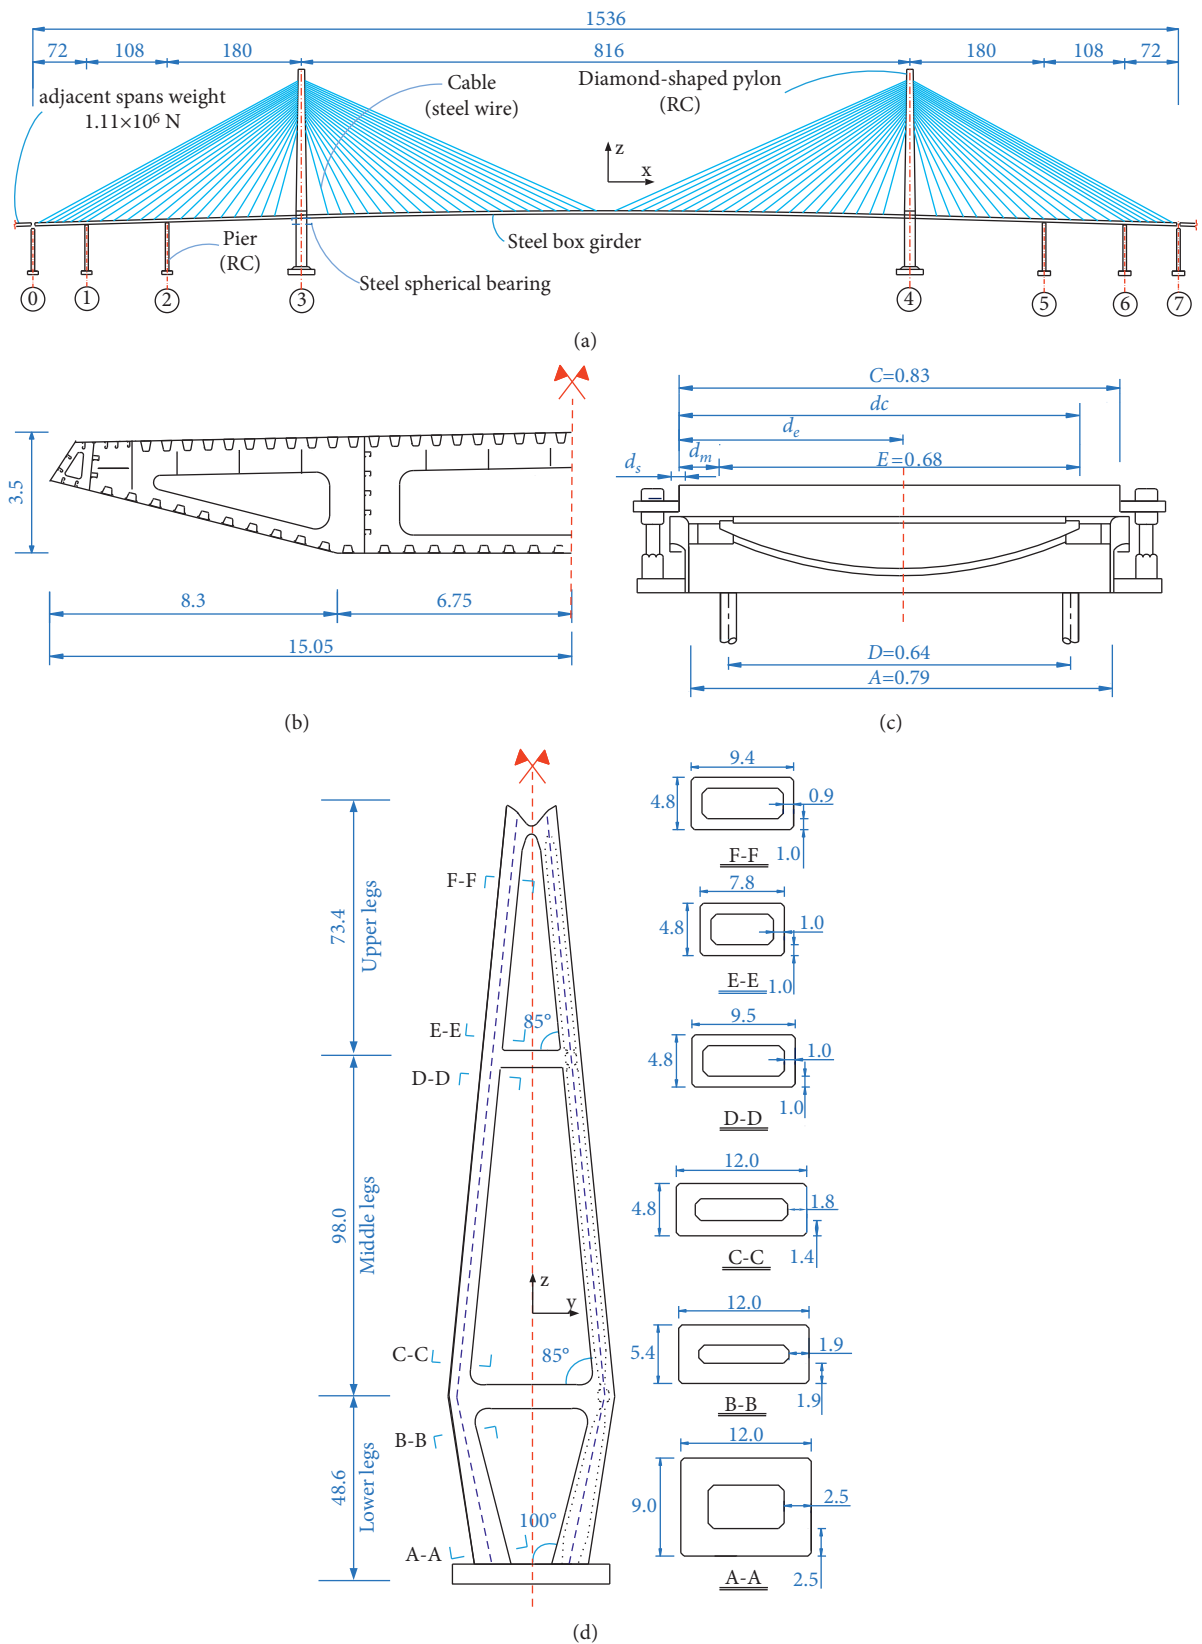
Overview of prototype bridge (unit: m). (a) General view of the cable-stayed bridge. (b) Cross section of the steel box girder. (c) Steel spherical bearing (QZ9000SX). (d) Diamond-shaped pylon.
